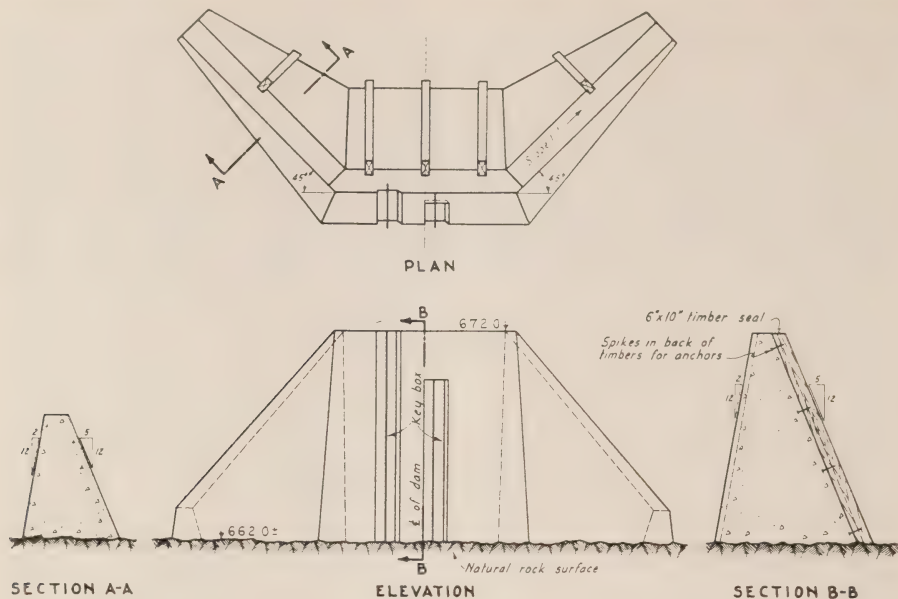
Wing Walls at Junction of Concrete and Earth Fill Sections.
